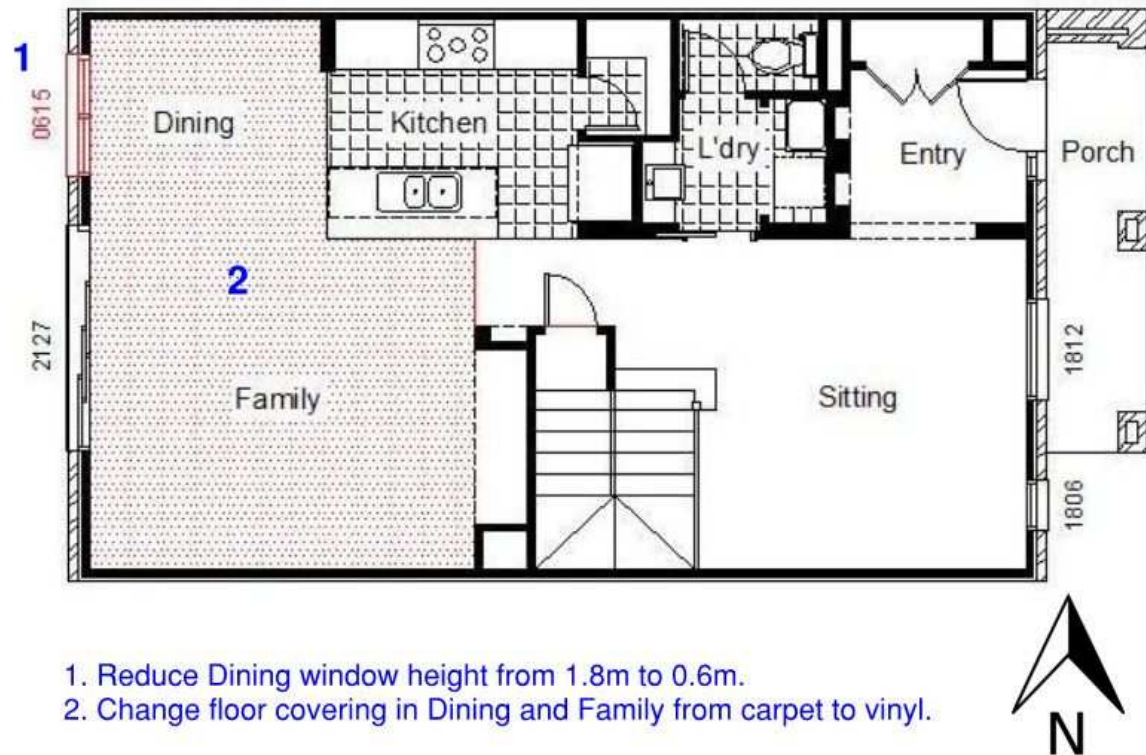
Redesigned ground floor plan for Dwelling 16 in Darwin.
